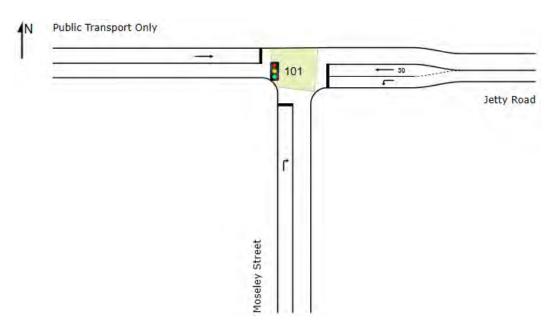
Moseley Street and Jetty Road Junction Layout - Option B and C
